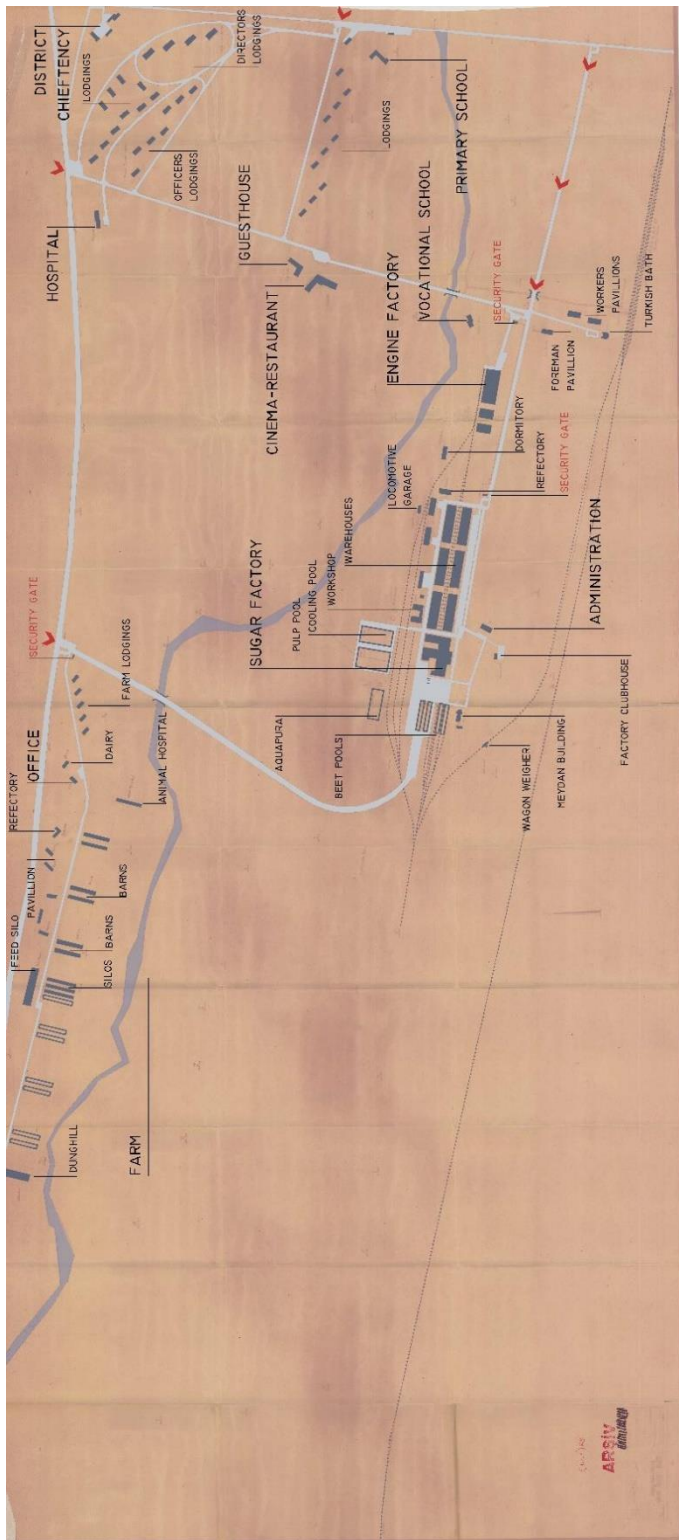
1958 Sugar Factory site plan (Etimesgut Sugar Factory Archives)
